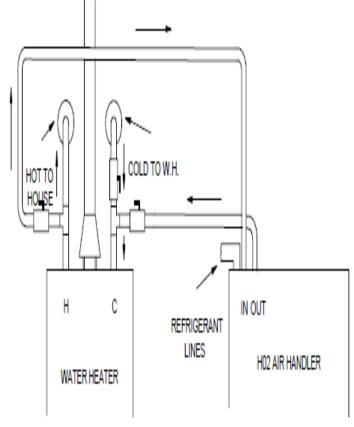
Typical Hot Water Tank and Refrigerant Line Connections
